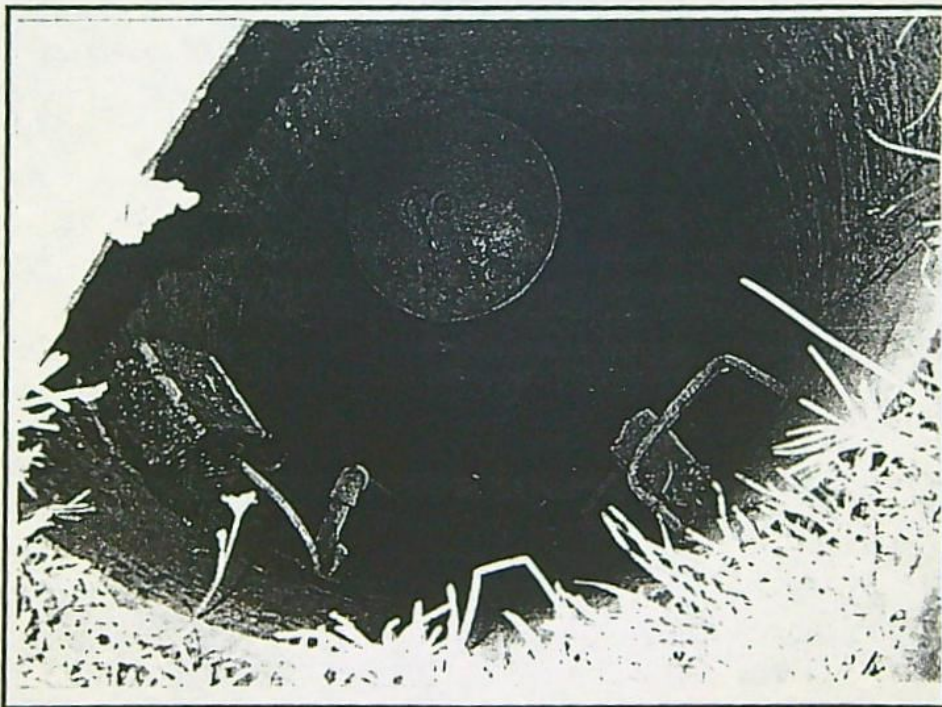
Supplemental Well. 10 inch steel casing with below ground pressure tank.
